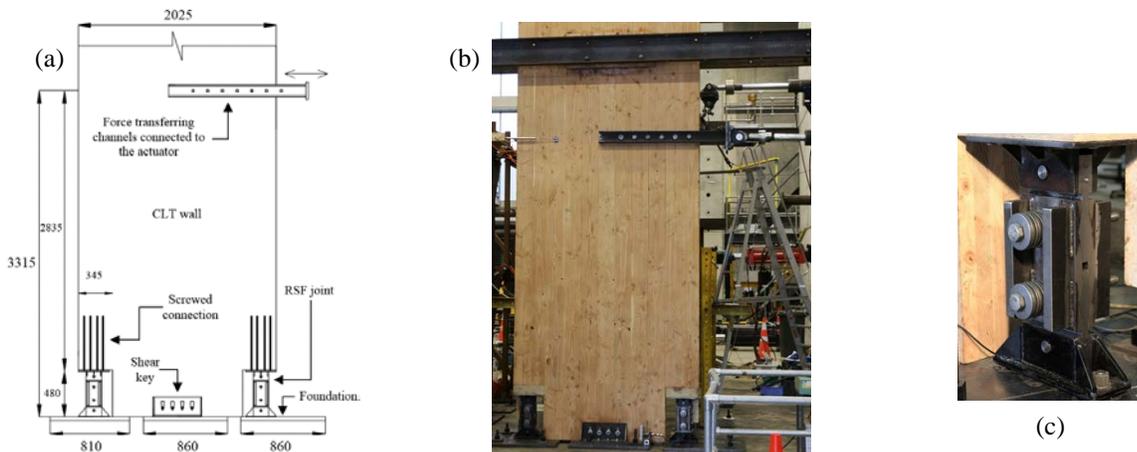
Experimental test of rocking CLT wall with RSF joints: (a) general arrangement, (b) test setup, (c) RSFJ
